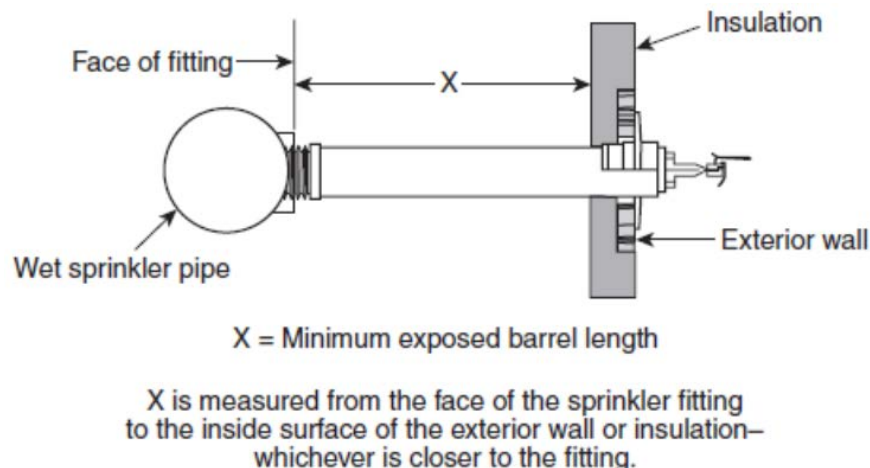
(a) Dry Sidewall Sprinkler Through Wall
